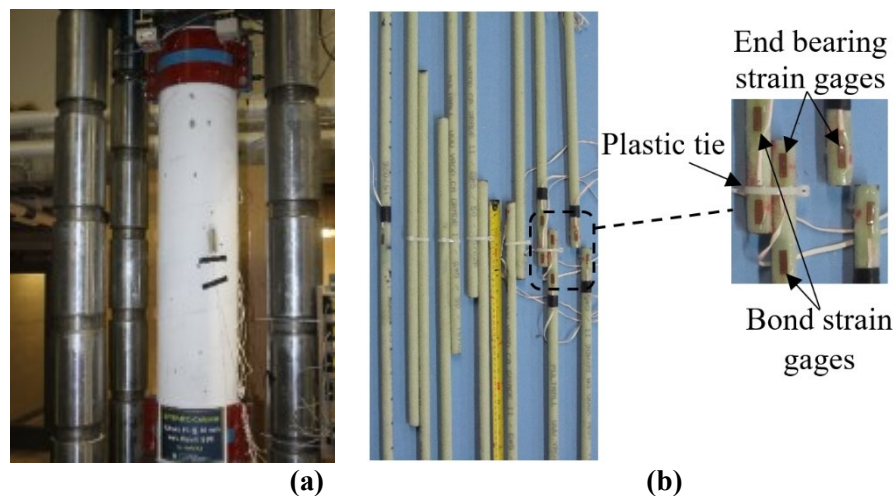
(a) Test setup and (b) instrumented GFRP bars at splices.
